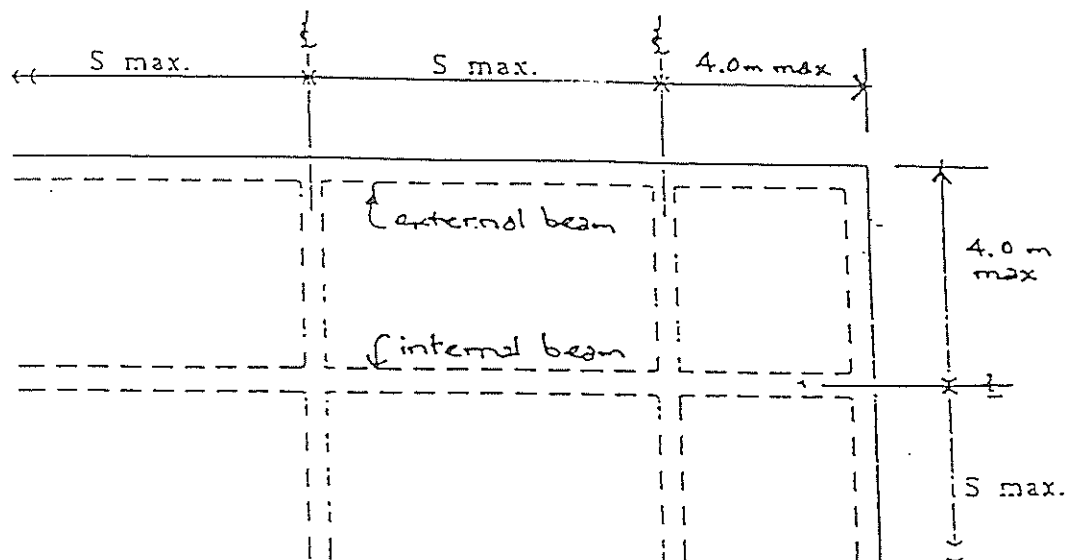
LAYOUT OF FOOTING BEAMS
